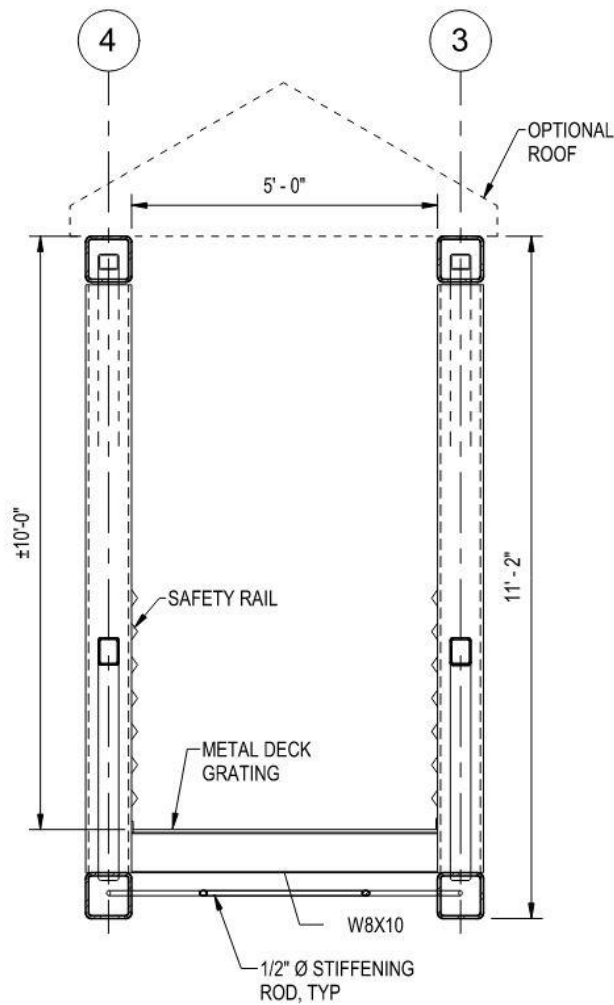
TRUSS BRIDGE CROSS SECTION, SPAN 180'
